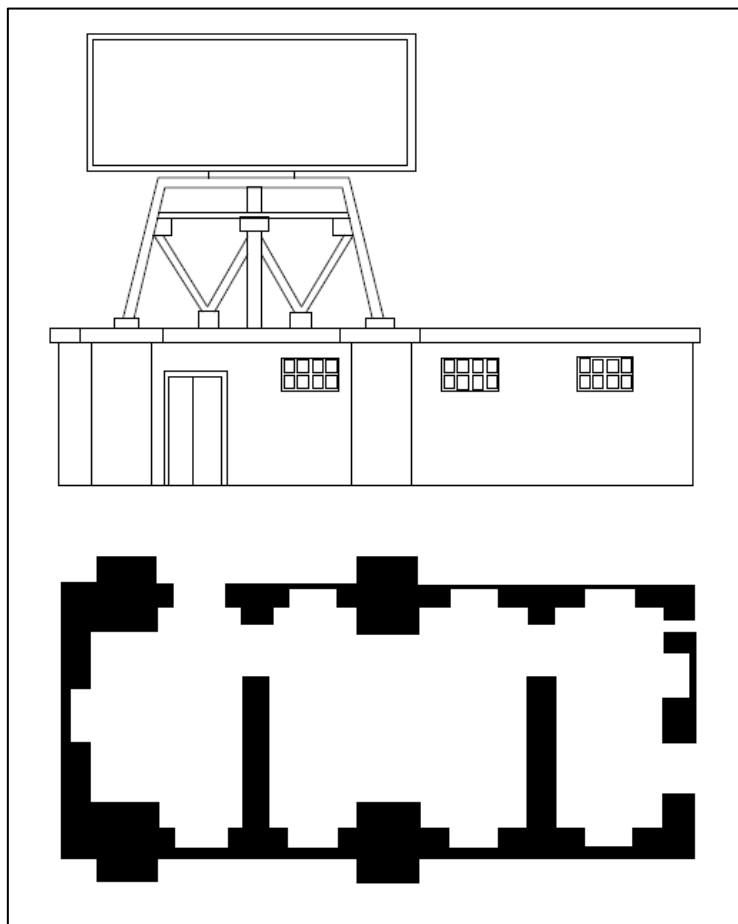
A simplified version of a survey of the Craster CHL station, Northumberland, redrawn from the Derelict Places website (www.derelictplaces.co.uk). The arrangement of doors is very similar whilst this plan and elevation show the buttresses supporting the aerial.
